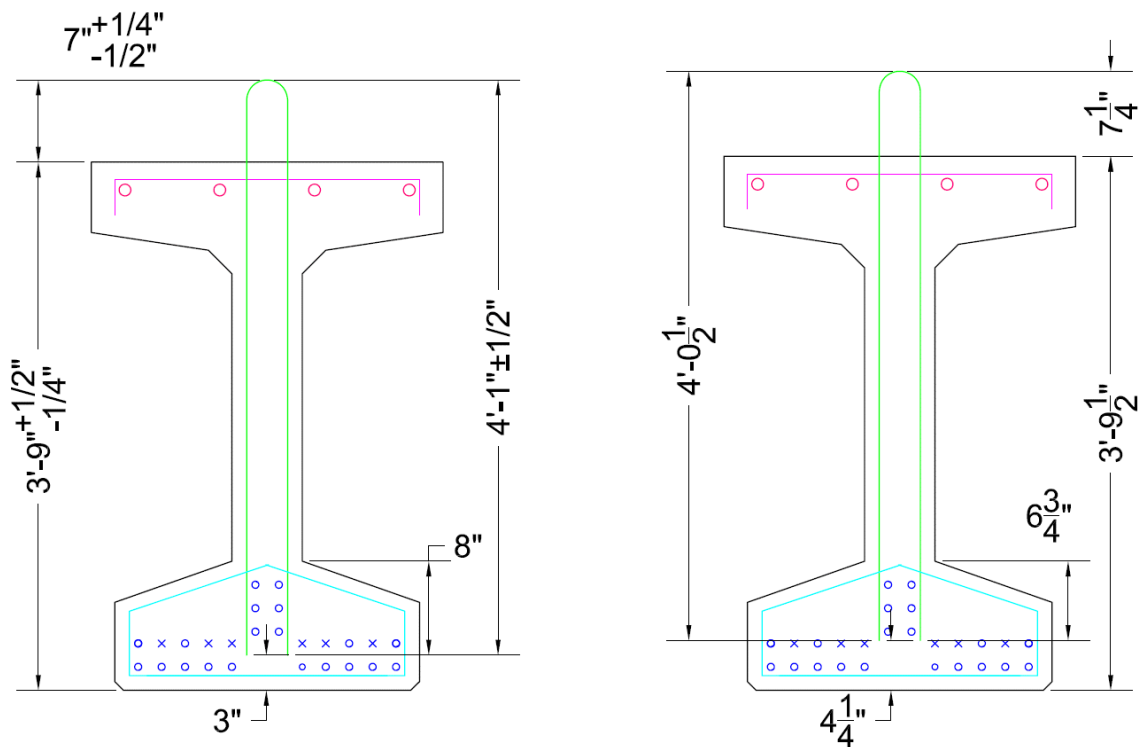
45M girder fabrication tolerances (left) affecting stirrup leg anchorage depth and worst case anchorage depth scenario (right).
